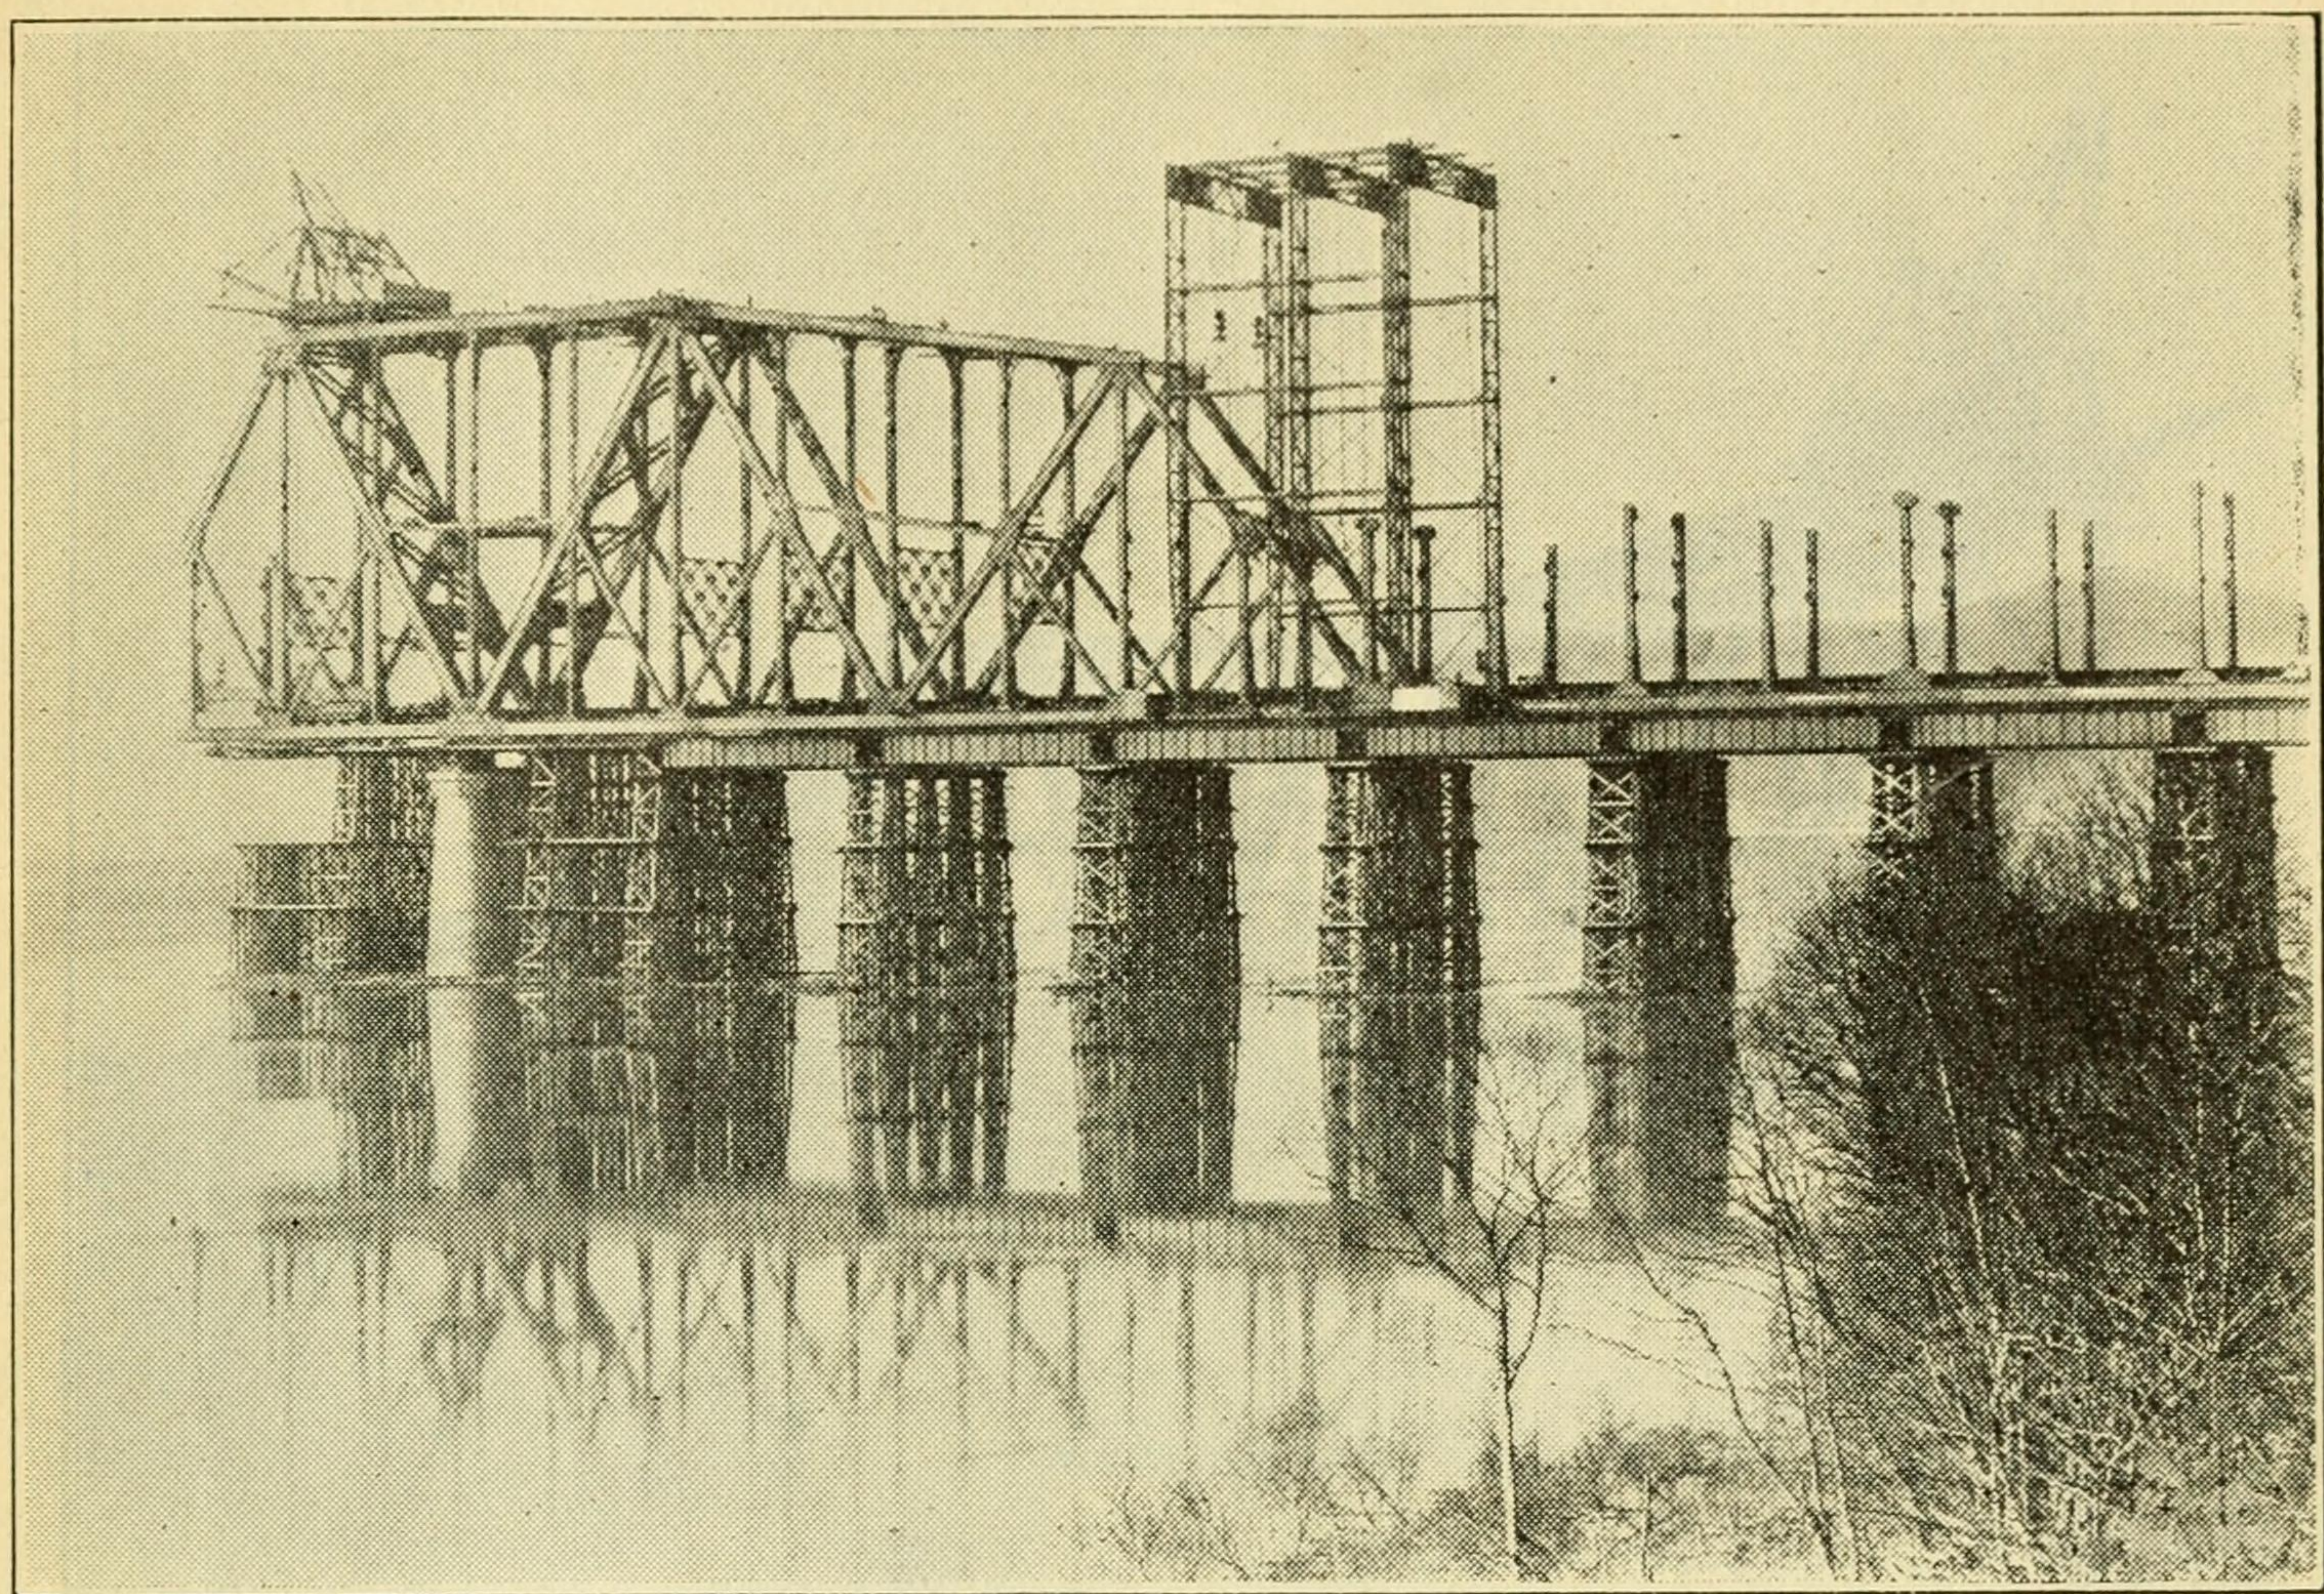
ERECTION OF TRUSSES, OHIO SPAN, SCIOTOVILLE BRIDGE.
